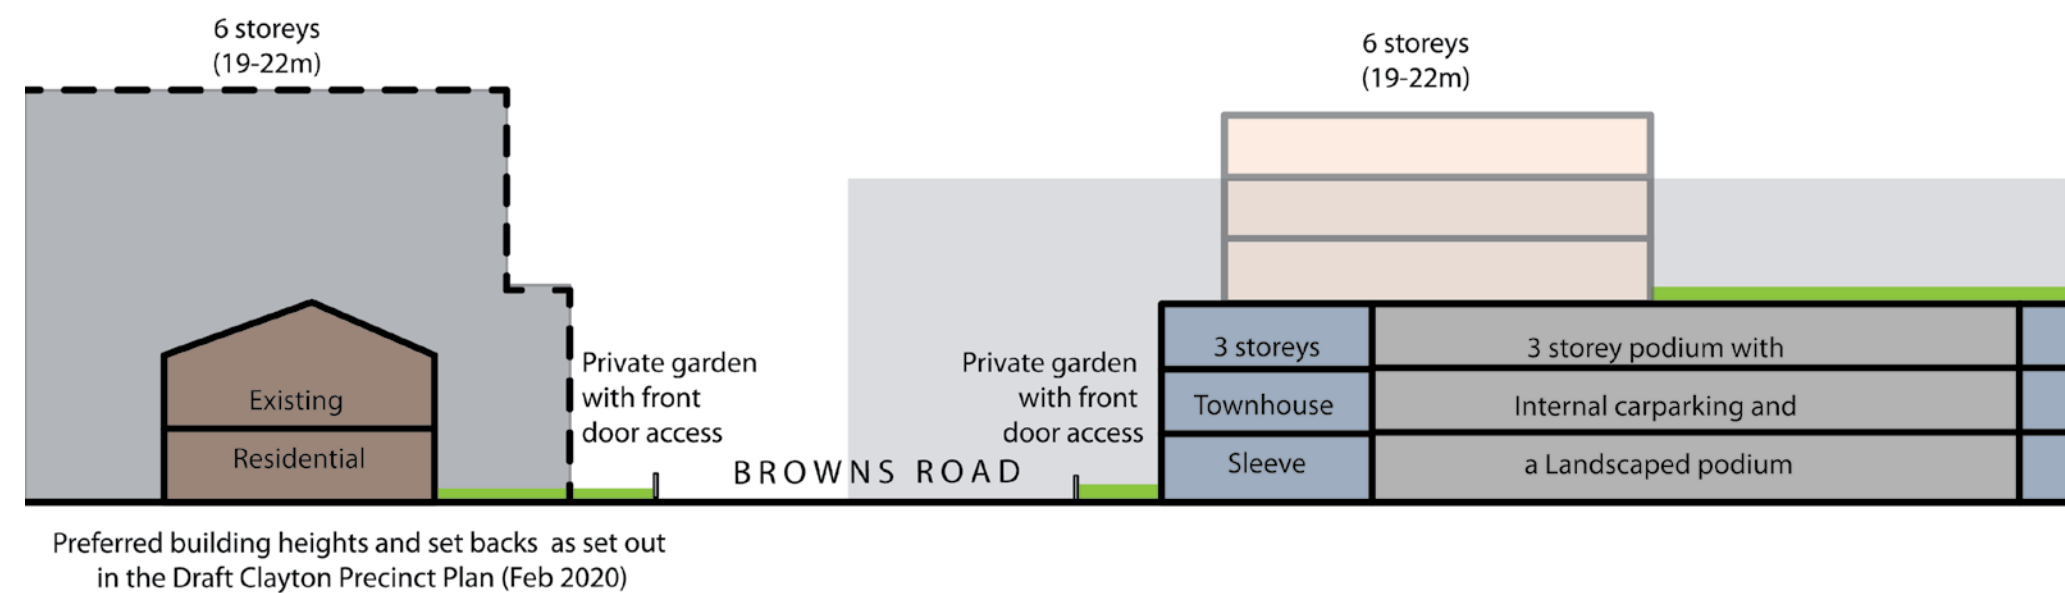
Browns Road Section - Apartment Building Scenario (demonstrating that sleeving the building with townhouses creates a street address, private front garden and front door access and no additional vehicle crossovers on Browns Road)
